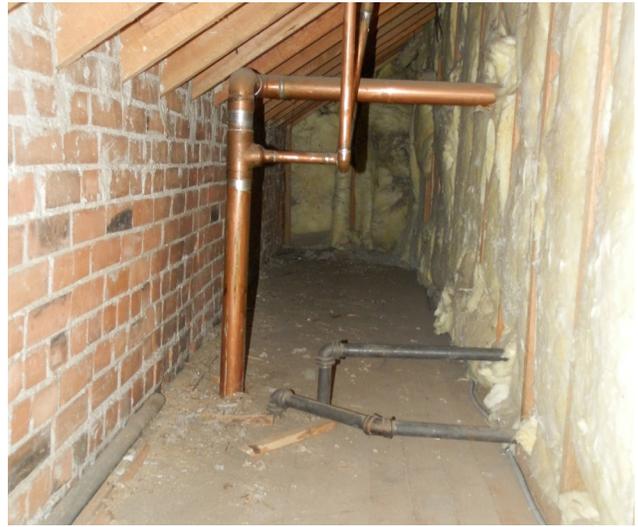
Eave attic masonry, 2020 (source: Ratio)
